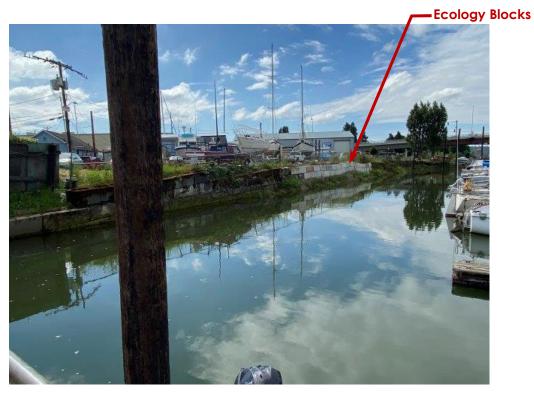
Retaining Wall Bulkhead (Looking North)
